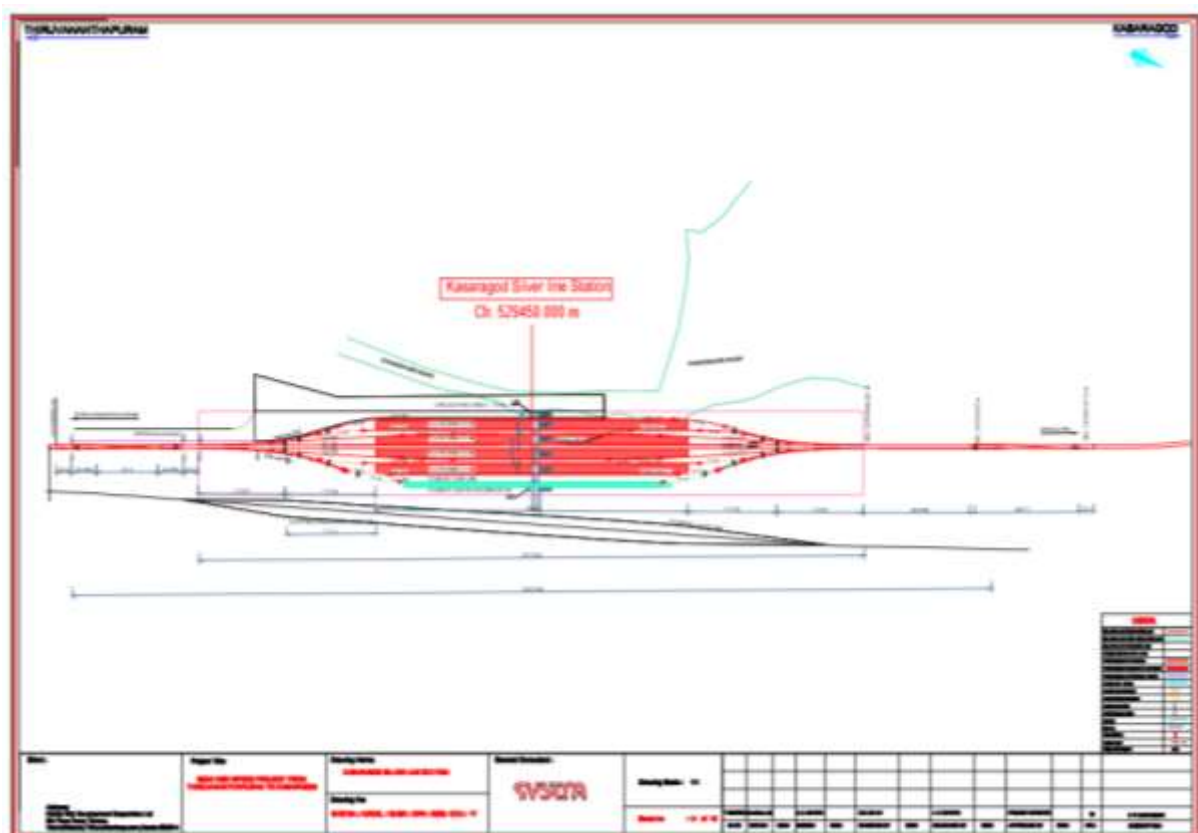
Kasaragod SilverLine Station Layout Plan
